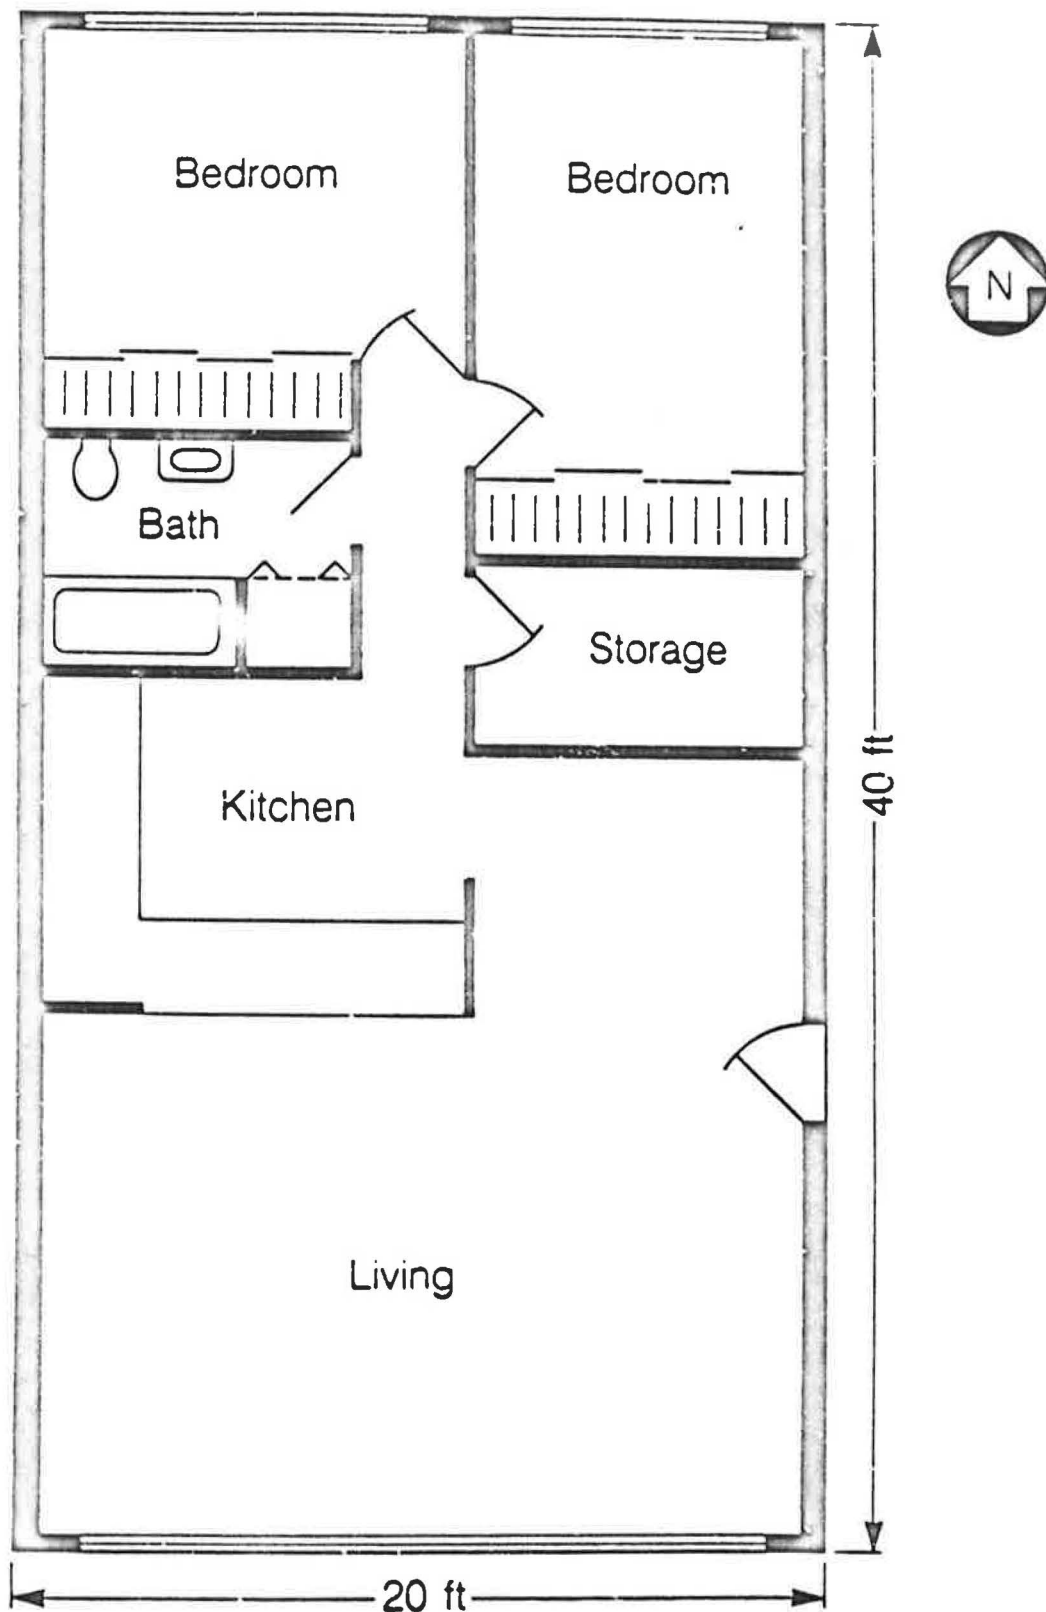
A typical apartment floor plan used to illustrate application of the mass balance approach to airflow analysis
